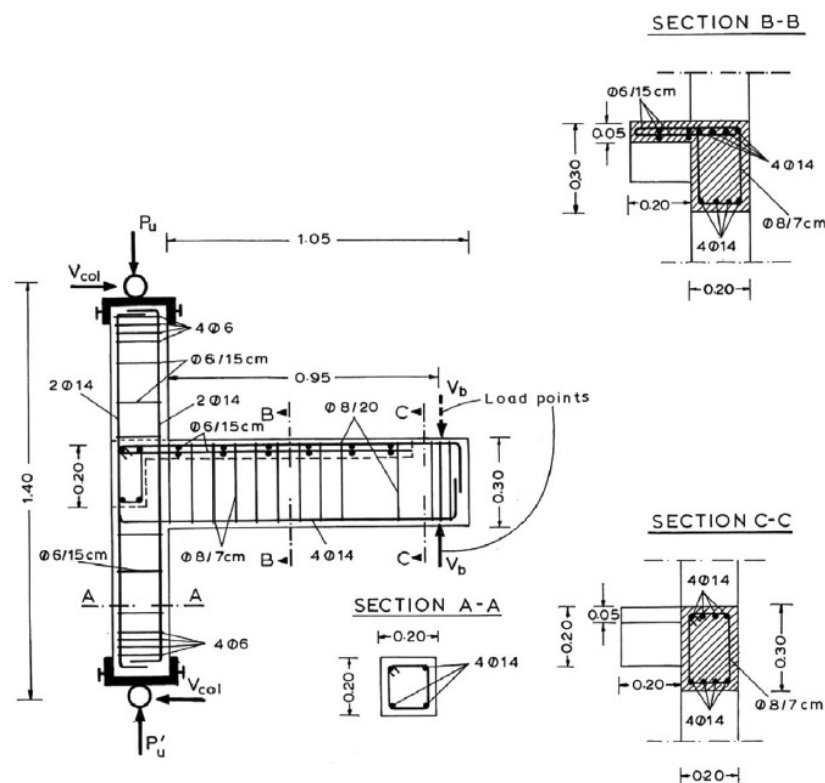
Dimensions and cross-sectional details of tested specimens, Tsonos (2008)
